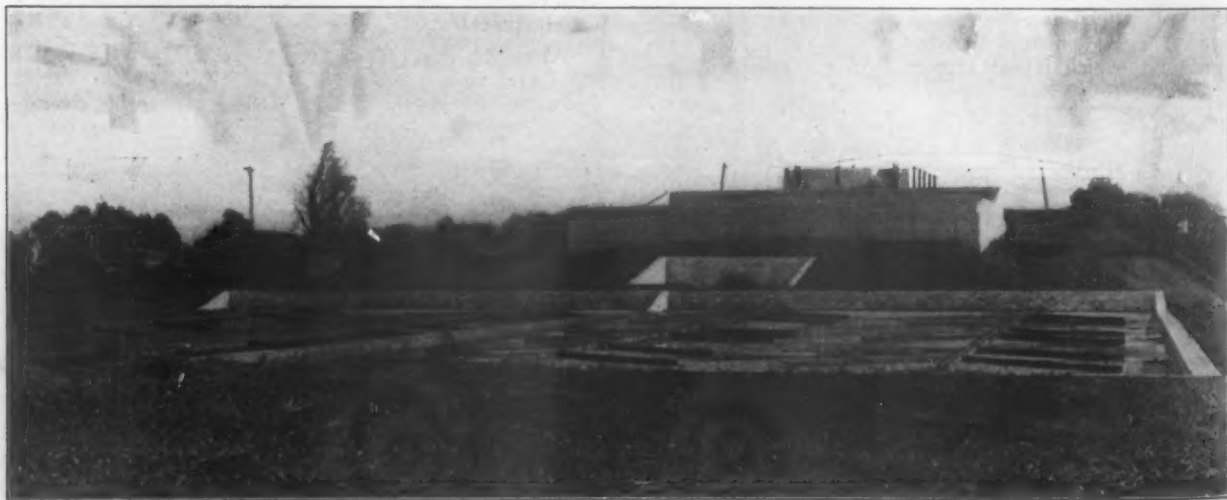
A Sewage Disposal Plant for a Hardware Works—General View from the River Bank.
